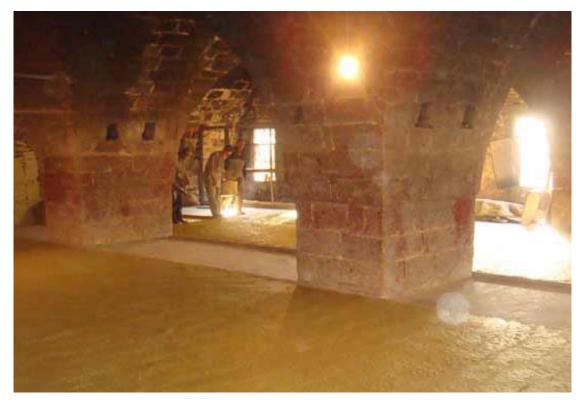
The cut stone masonry piers on the spreading area on the first floor in Sadık Adra Soap Factory, Tripoli
